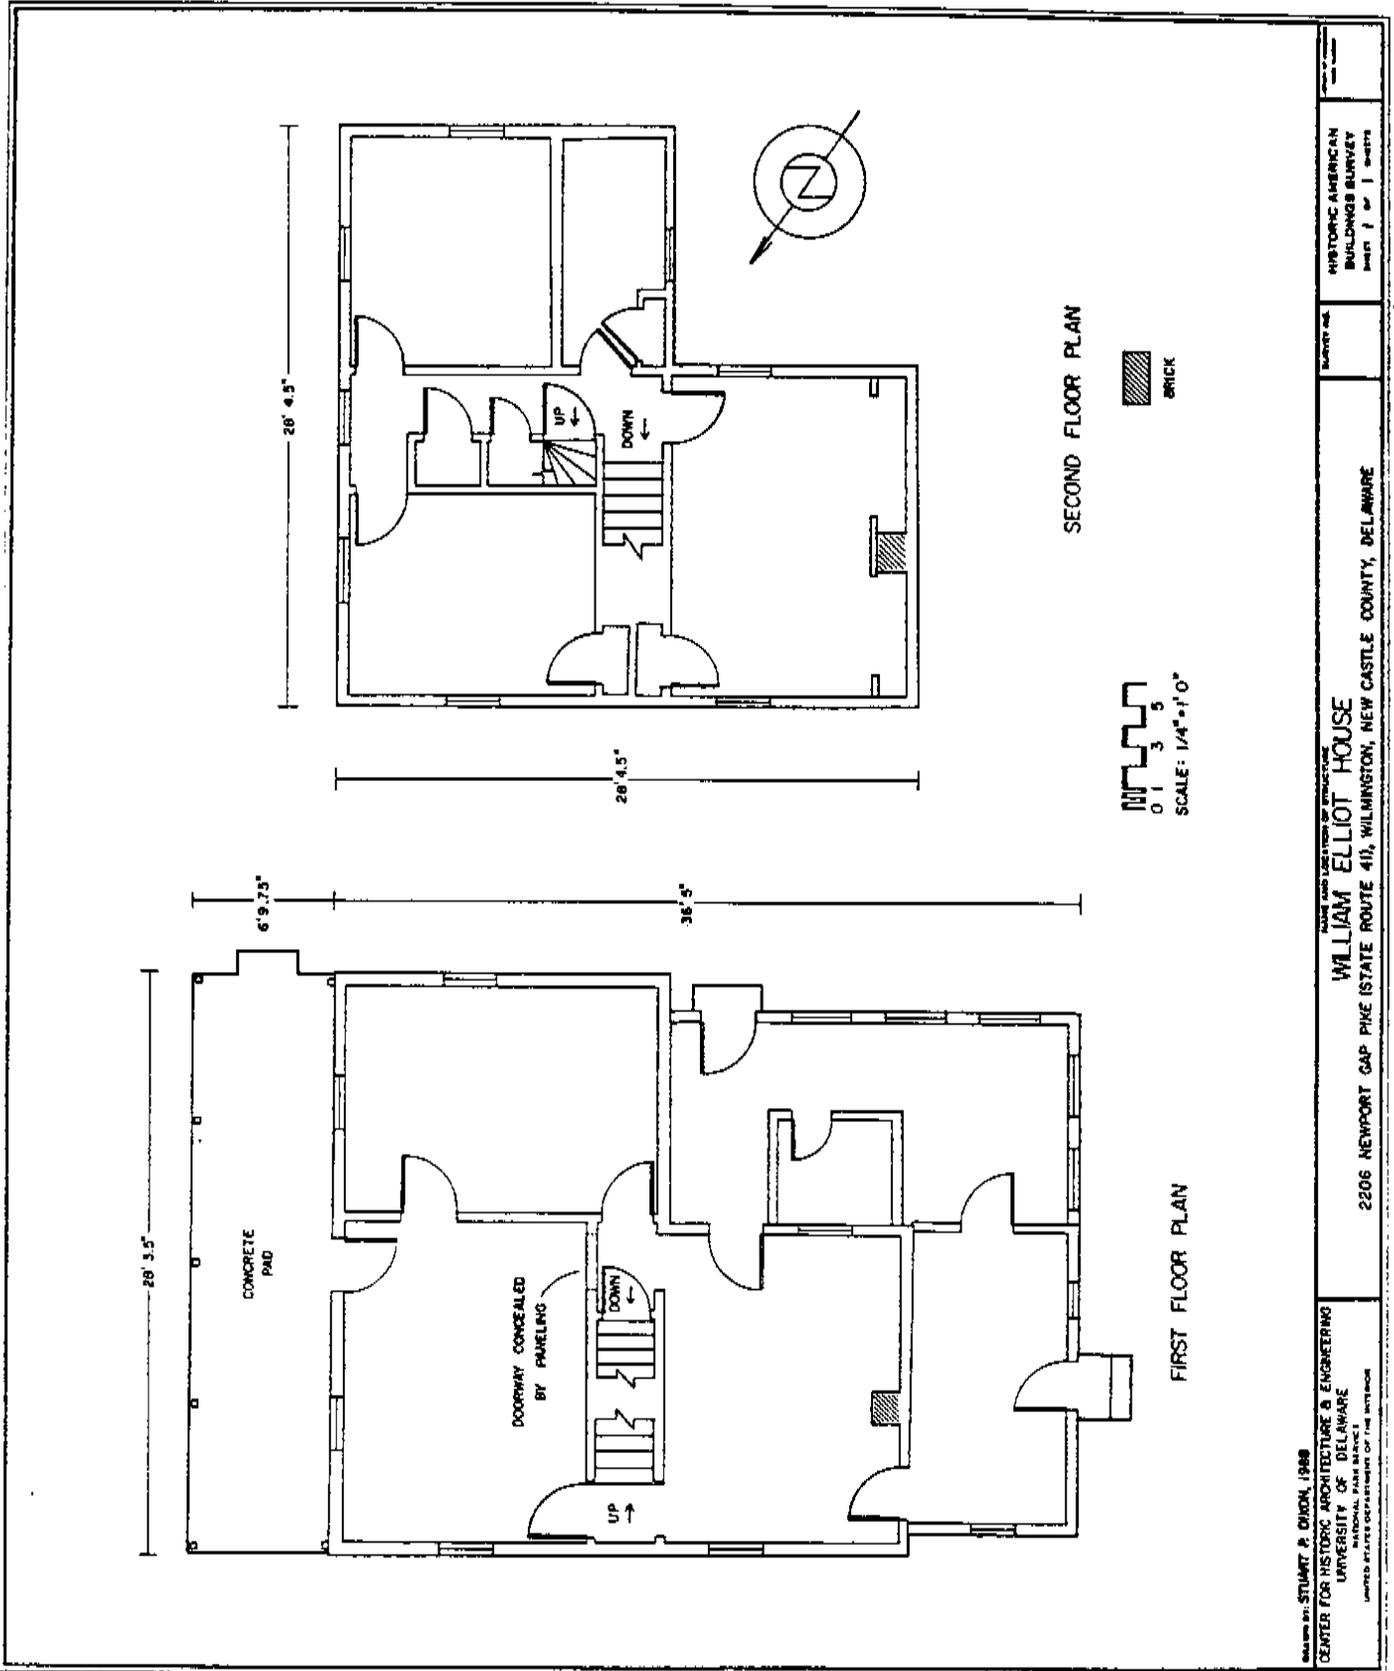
Floor Plan of the William Elliot House (Drawn by Stuart Dixon)
